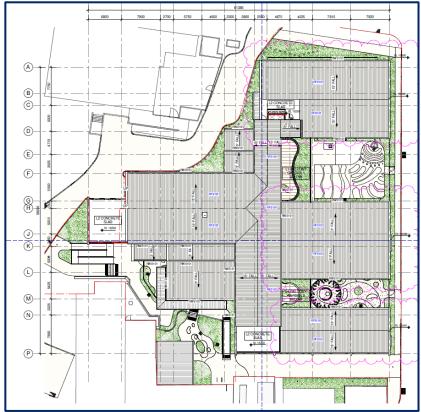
Updated Roof plan (courtesy: NBRS, 2024)
